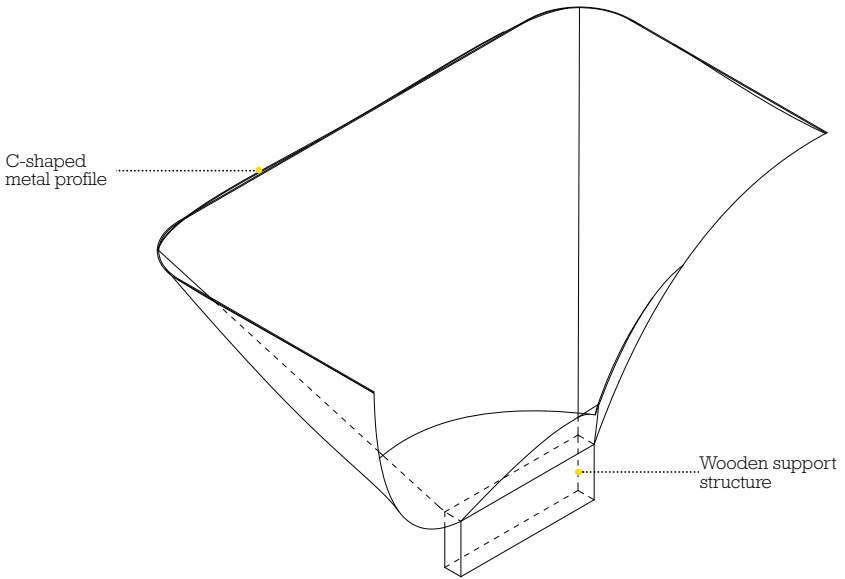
Construction detail - Central outfitting element | Axonometric view.
